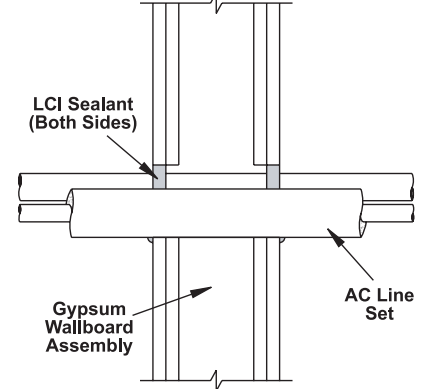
BARE & INSULATED METALLIC PIPES - Gypsum Walls
